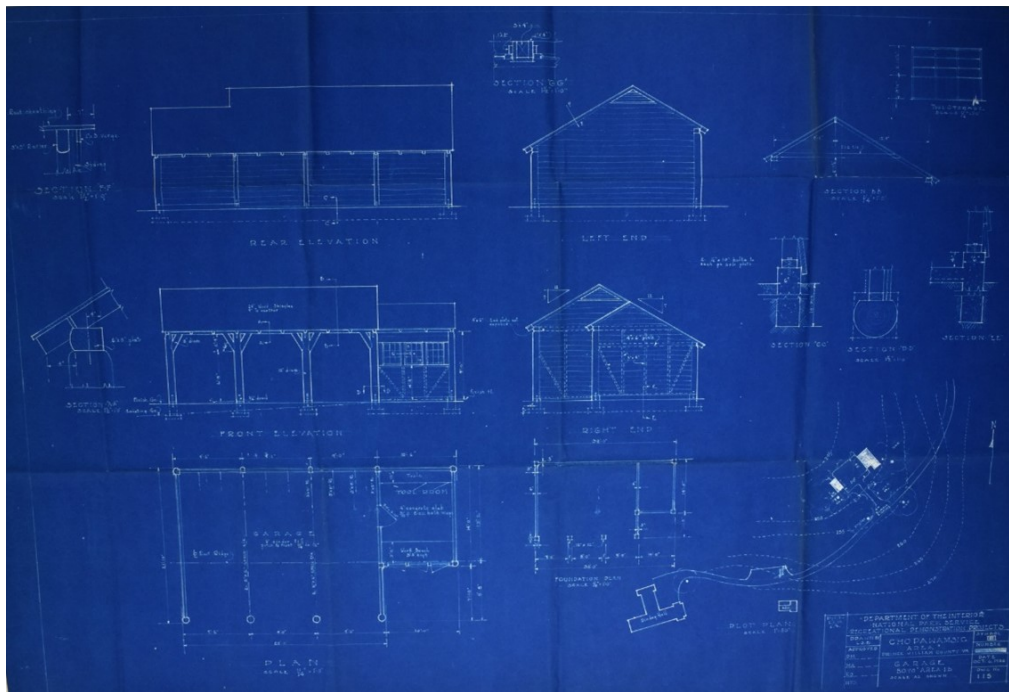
Plan for the garage building constructed at Cabin Camp 2. (PRWI Collections 3422)
